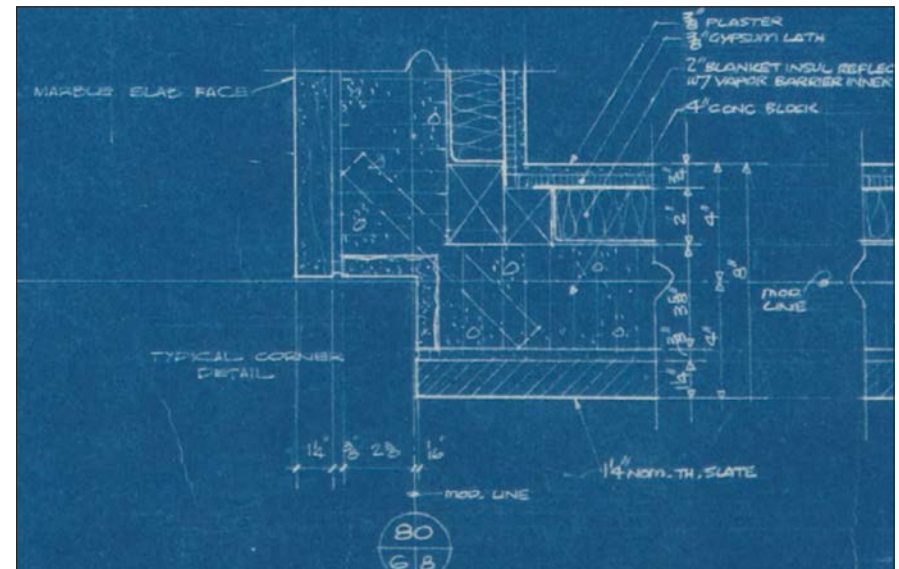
Detail of window framing, Sheet A-7. Date 1955. Credit: MHG\_Illa\_FF041\_014, Miller House and Garden Collection (M003), Newfields Archives
